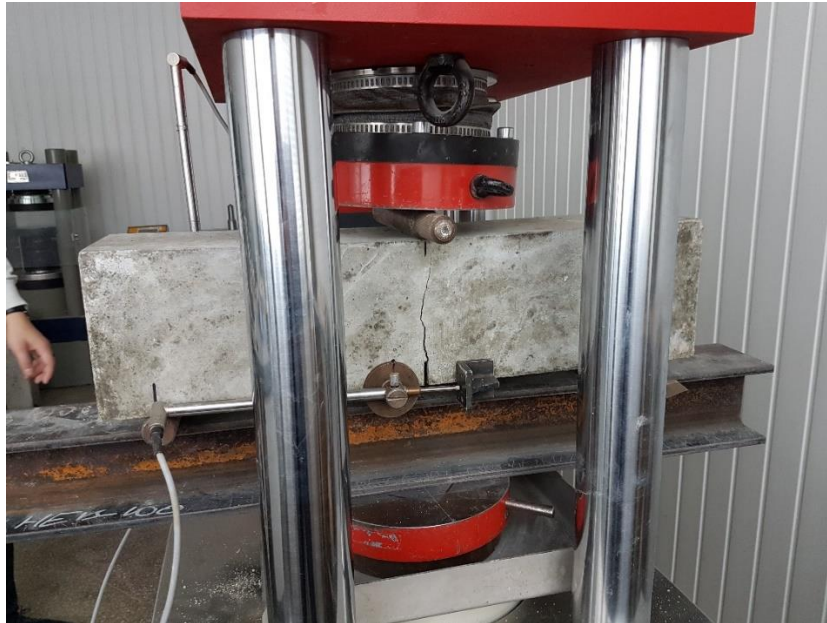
Typical arrangement for measuring CMOD in the KTU laboratory for one of the specimen used for experiment
